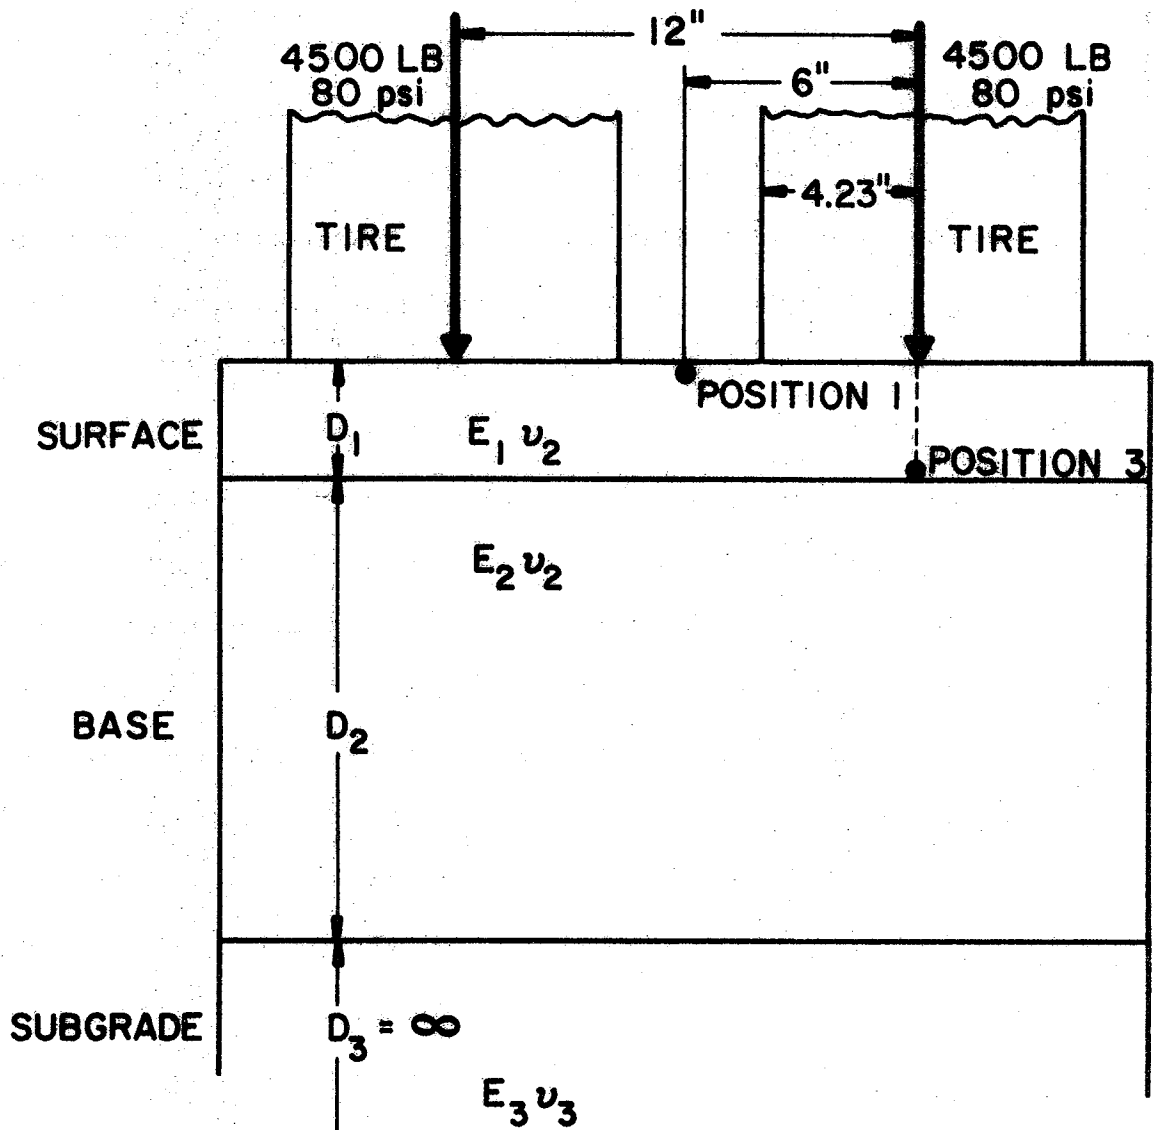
PAVEMENT STRUCTURE AND DUAL-WHEEL LOADS OF PROBLEM 1
